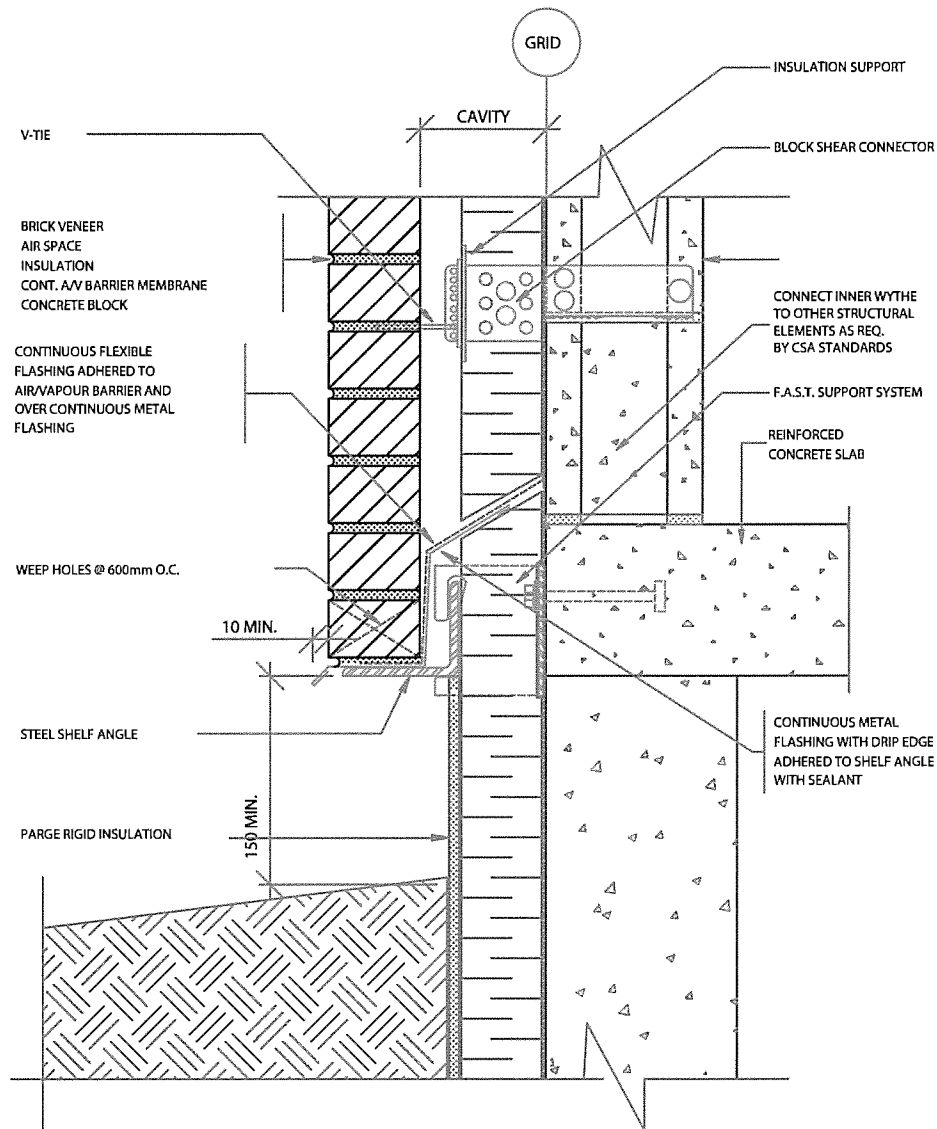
Brick Veneer / Concrete Block Detail at Foundation
